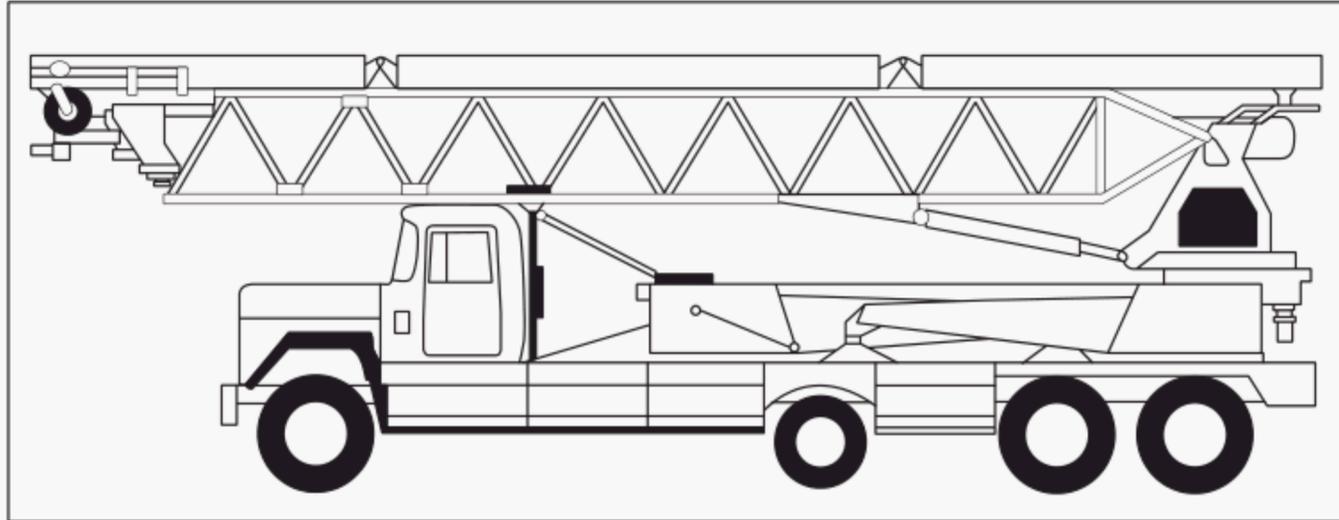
Material Placement System: Truck-Mounted Telescopic Conveyor System
